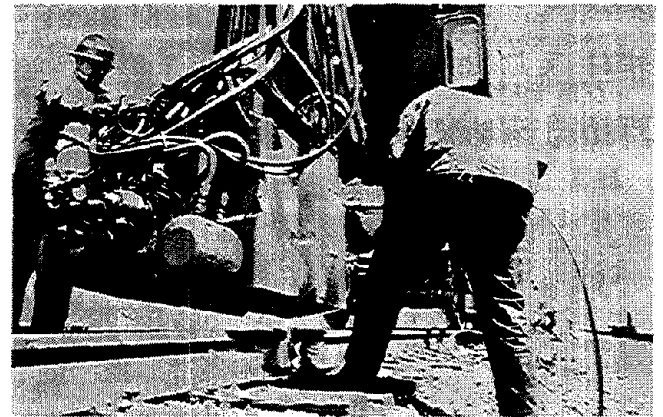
In-track welder clears rail upon completion of weld. (Photograph courtesy of AT & SF.)
